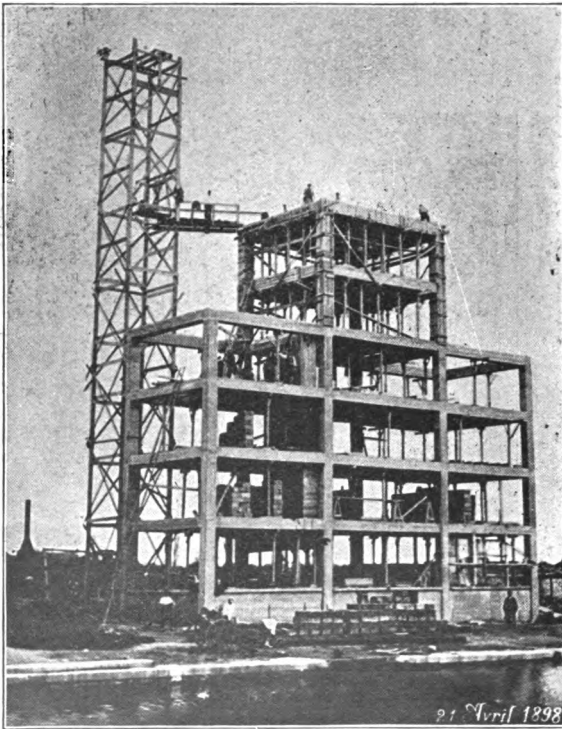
Reinforced Concrete Skeleton of a Flour Mill.
